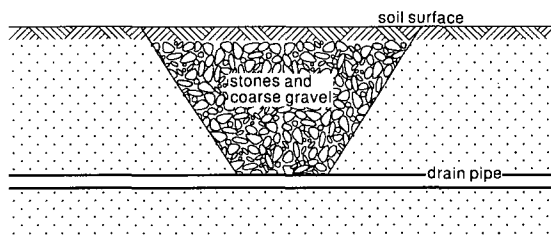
Blind inlet for surface water into pipe drain (SCS 1971)
